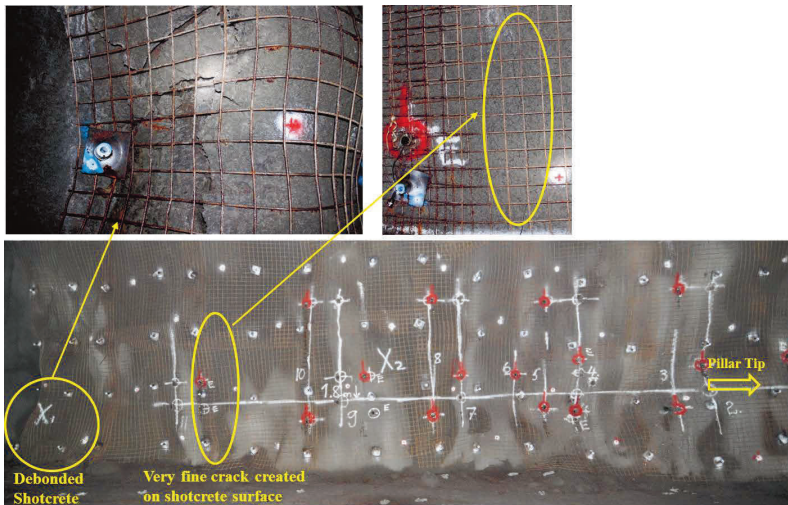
Test wall in cross-cut 100. The location of damages are highlighted
